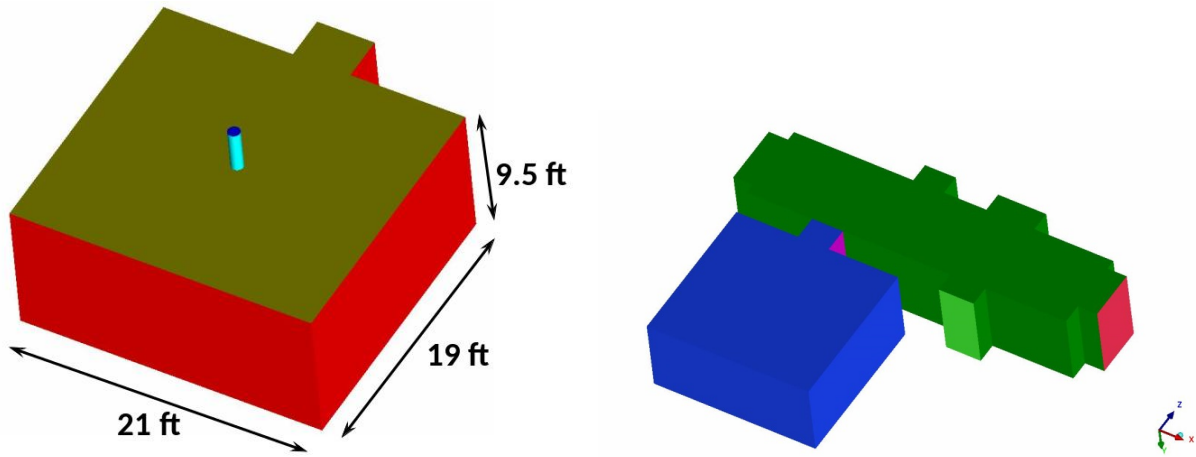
2a : Dimension details of Room 3, 2b : Room 3 with hallway
